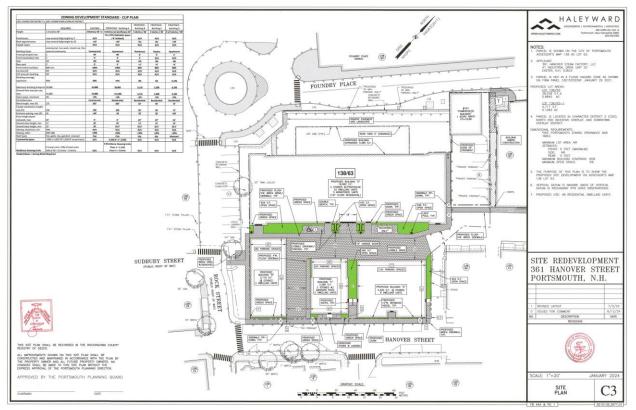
Preferred CUP Plan showing Proposed Buildings, Driveways, and Open Space
